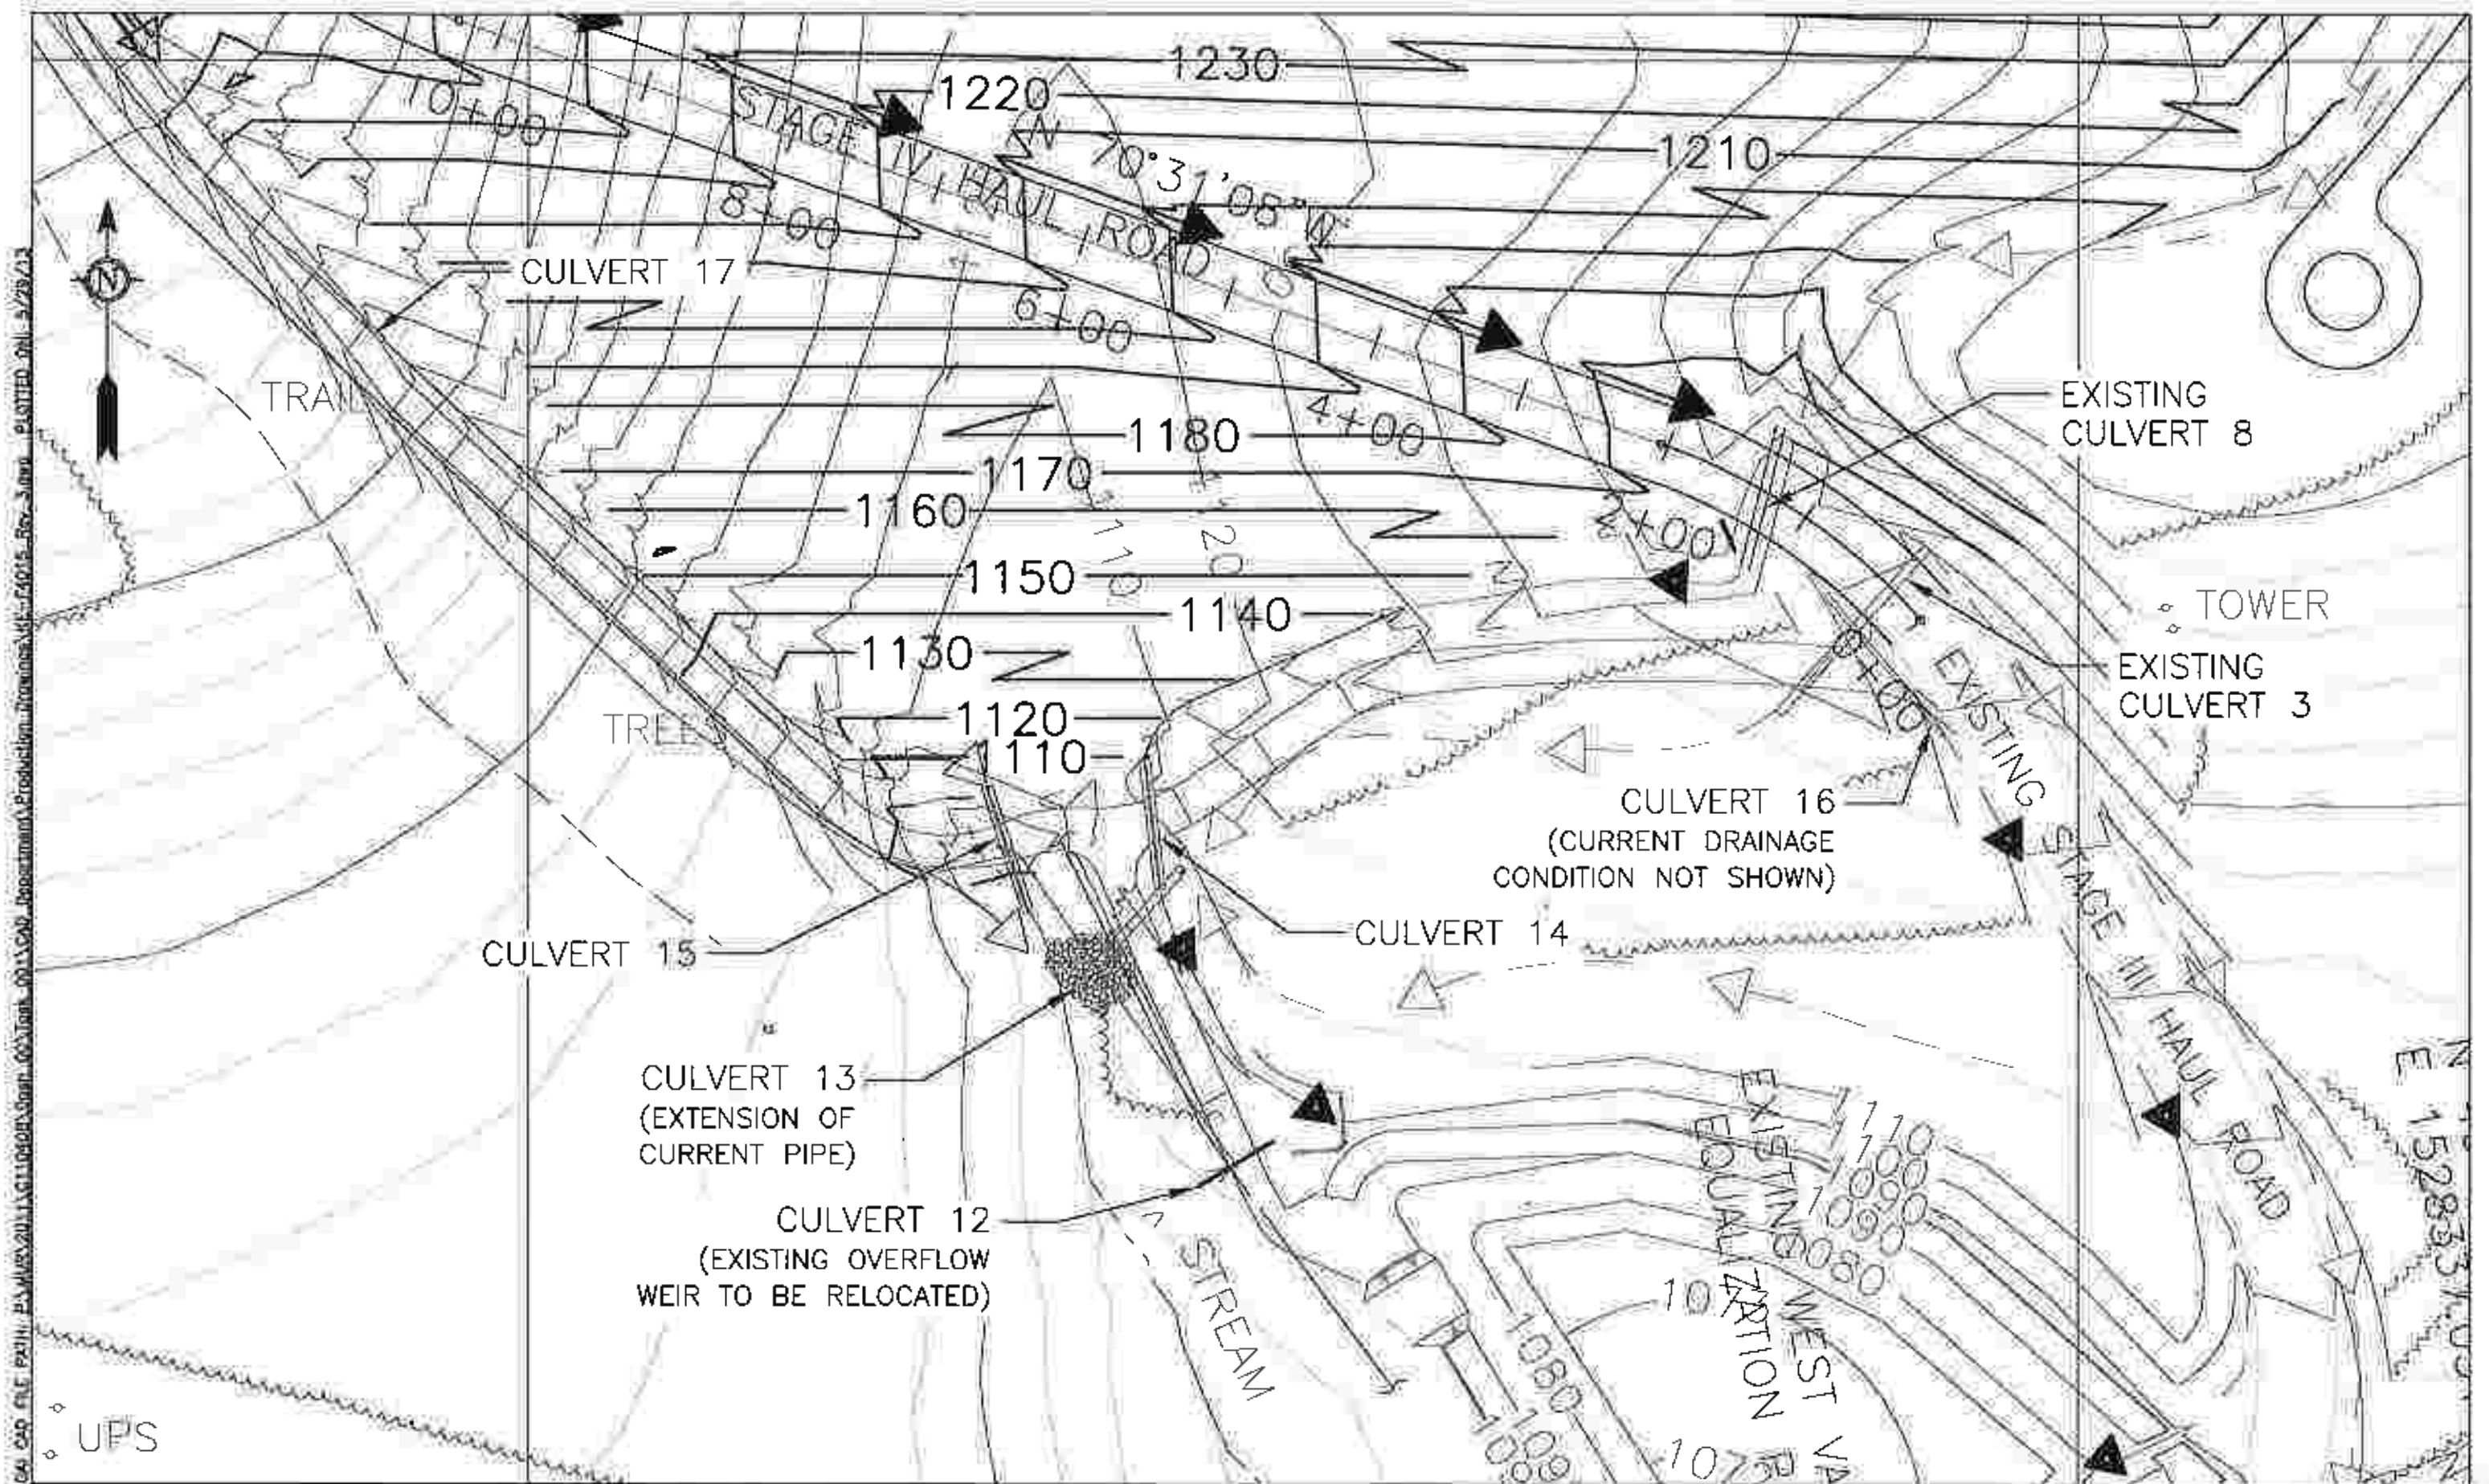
STAGE IV TOE DRAINAGE WORKSHEET
